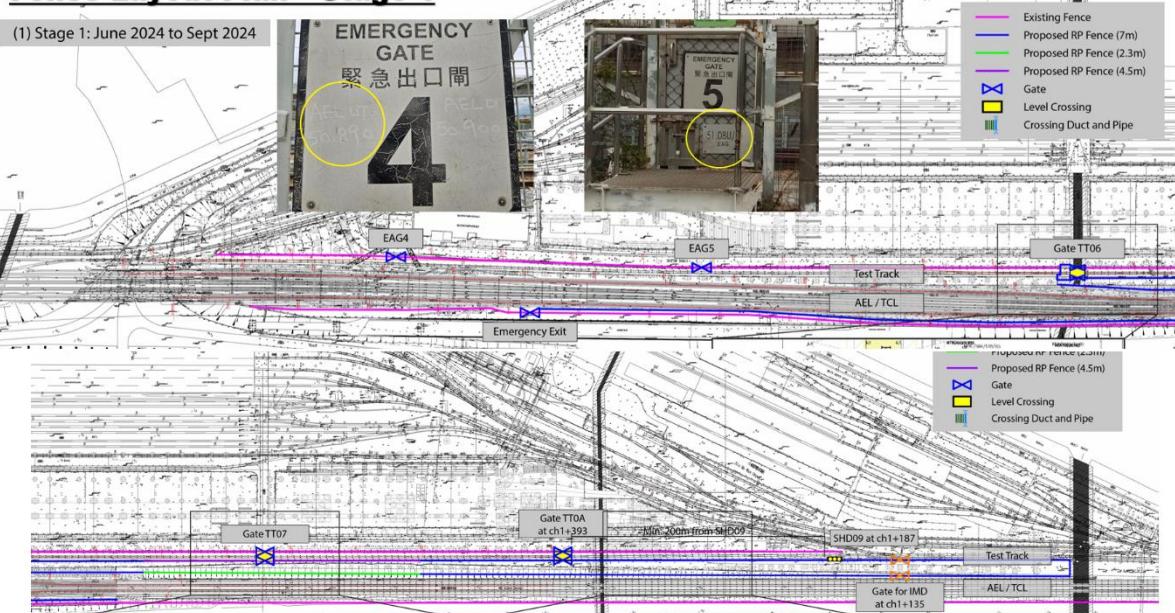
Stage 1 RP Fence Layout Plan
